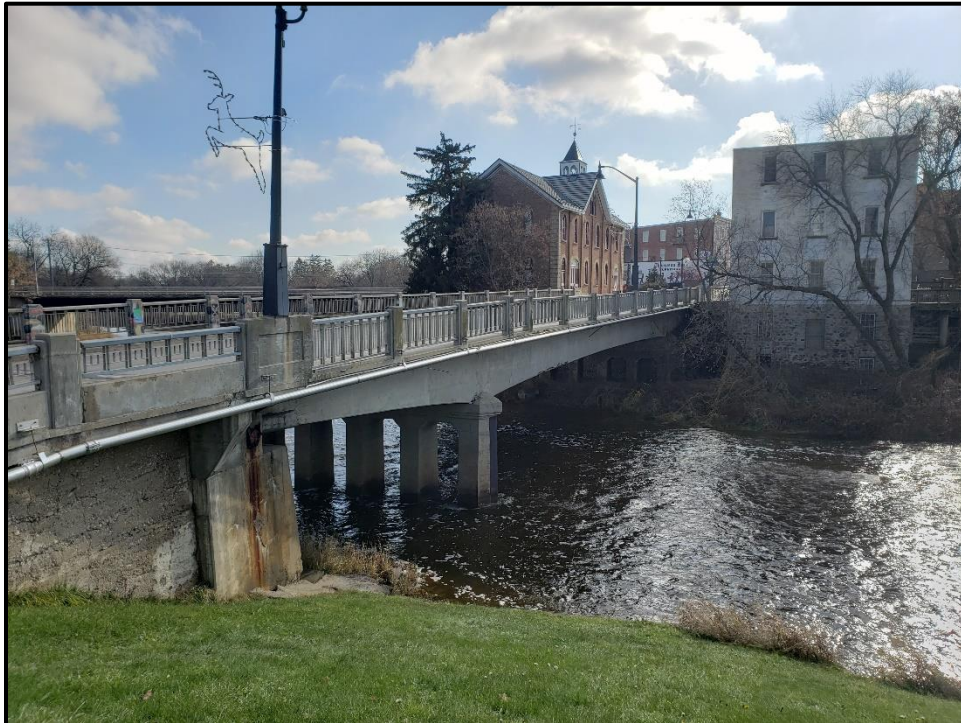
North Abutment of Bruce Road 3 (TMHC 2019)
